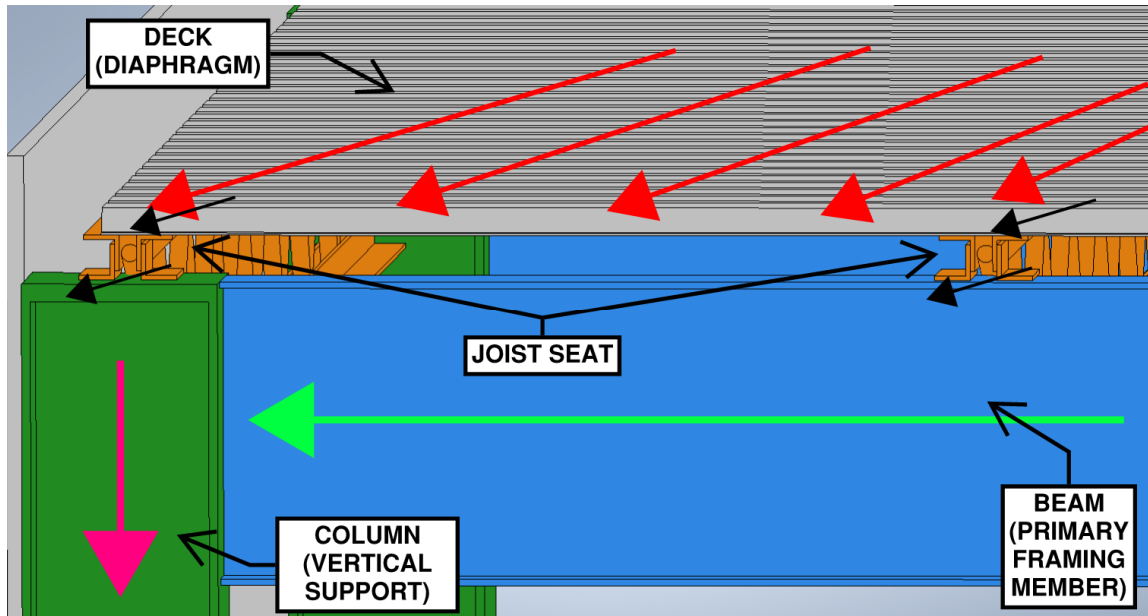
Lateral Loading from Diaphragm Passes Through Joist Seats to Primary Framing Element
